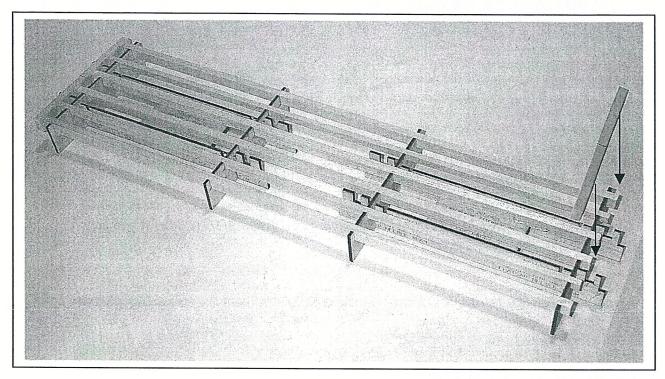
2^{nd}$ end sill ready to be placed in position
